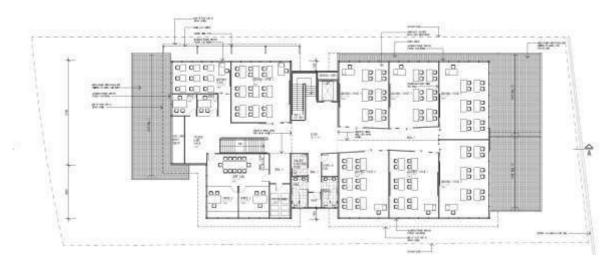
Extract of the first floor plan (source: accompanying architectural plans prepared by Koturic+Co)
